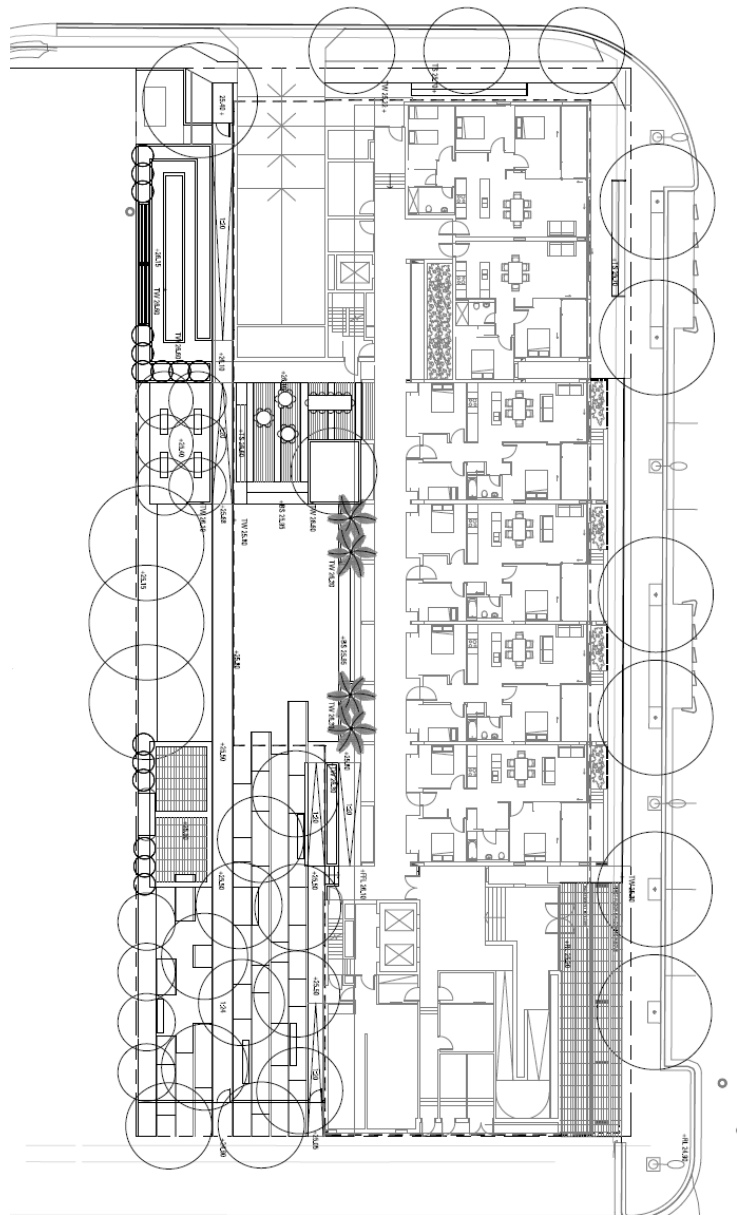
Updated ground floor plan incorporated with wind tunnel test findings
